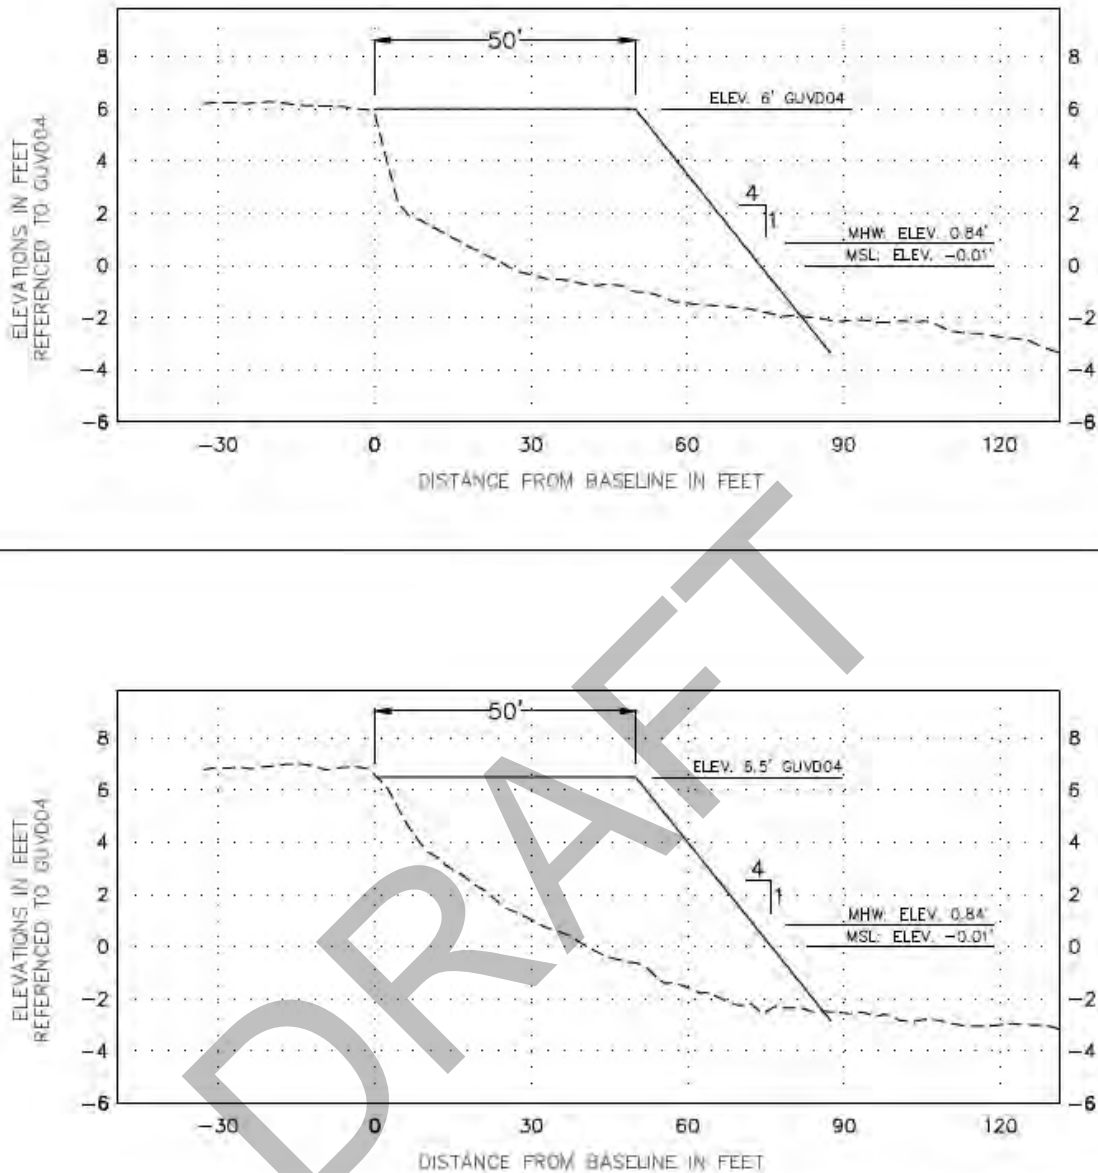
Cross Section Concept Drawing of Beach Reclamation Fill Area at Nimitz Beach Shoreline
